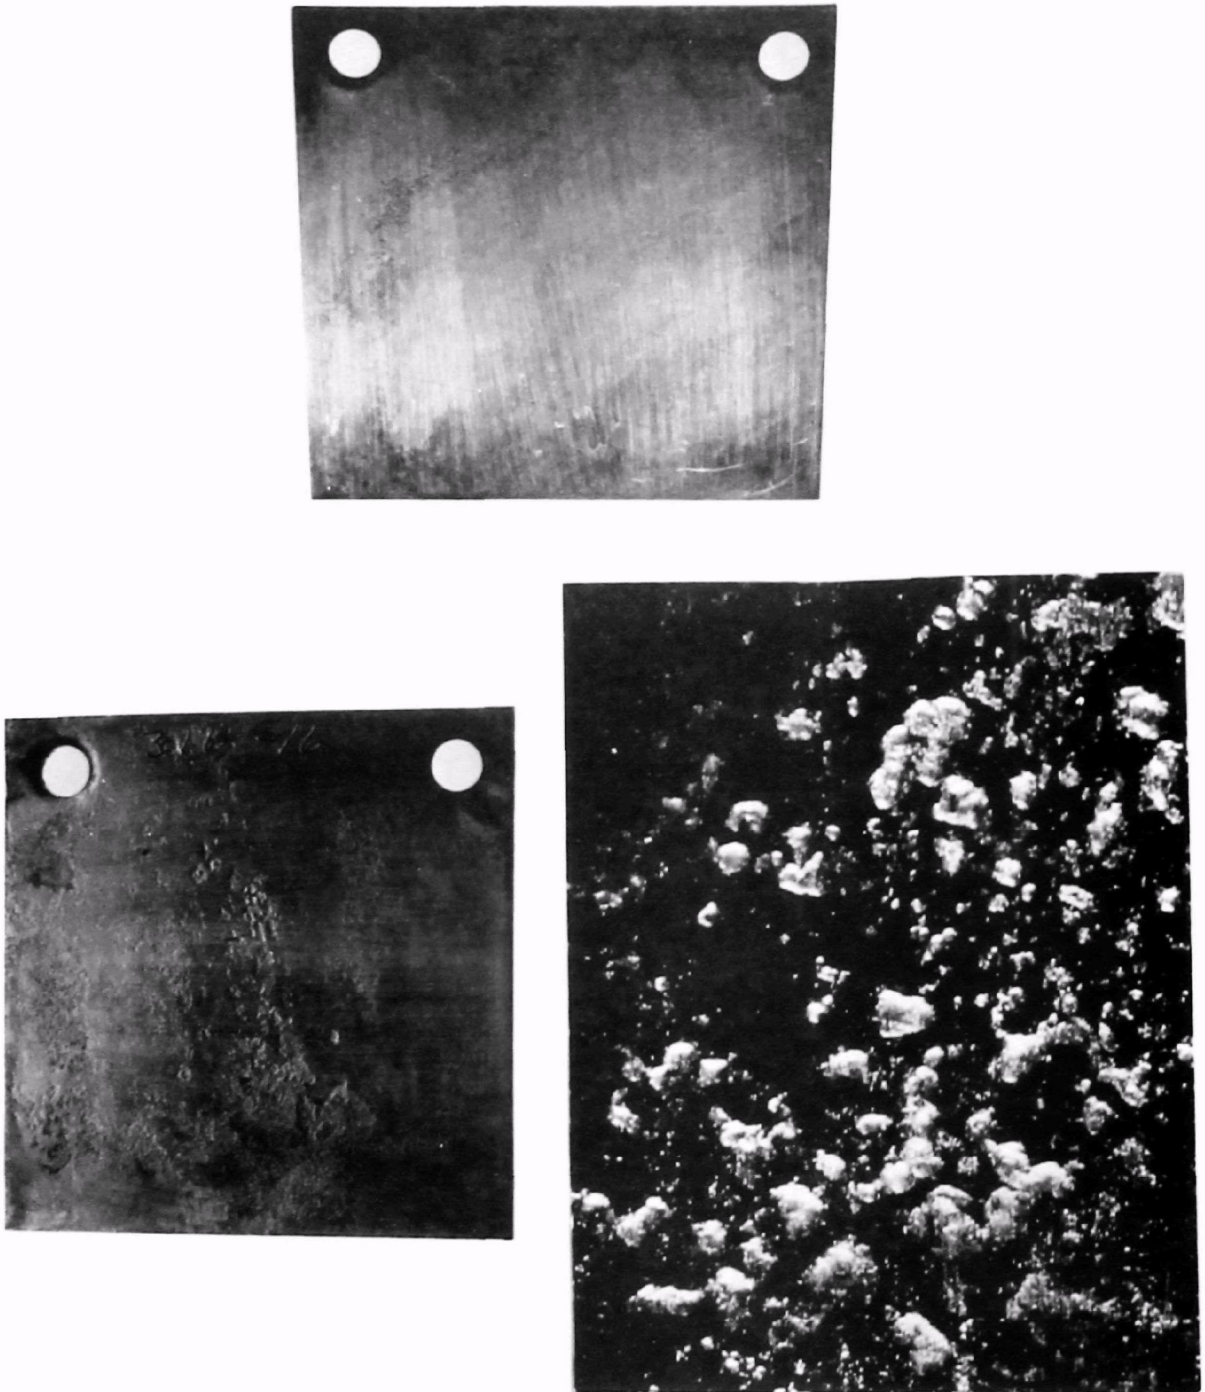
Coupons 316-23 (top) showing mild attack and 316-16 (bottom) which has extensive pitting attack. Lower casing.
